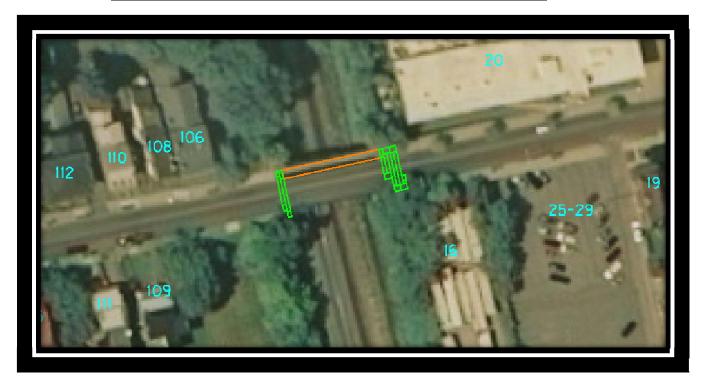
Preliminary plan view of Alternate X. The orange lines represent the proposed pedestrian bridge, and the green lines represent the proposed pedestrian ramp to the bridge.
